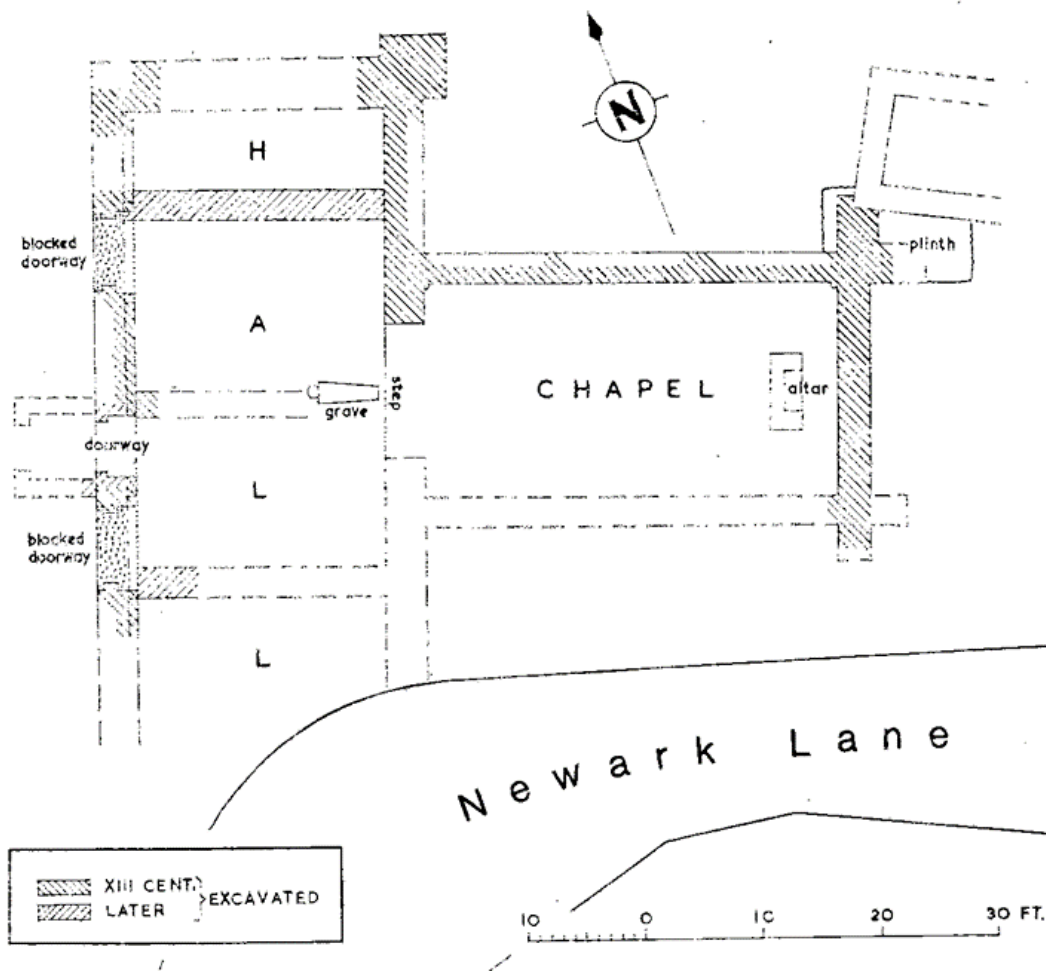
55: The plan of excavated walls at St Mary's Hospital, Strood. The T-shaped building may have housed a mixed community within the arms of the hall, but it later underwent a series of modifications, as did the chapel, with the infirmary hall being significantly shortened (Harrison 1969, 143, Fig. 2). Reproduced with permission of Kent Archaeological Society
